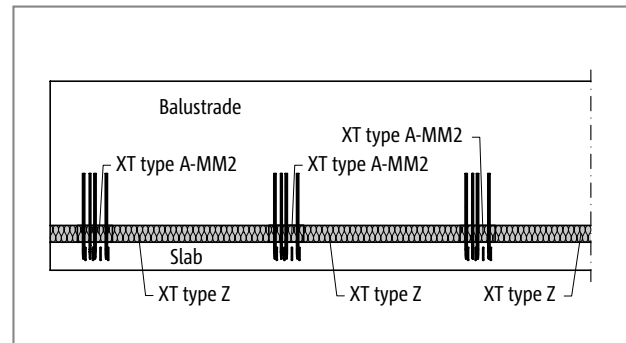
Schöck Isokorb® XT type A, Z: Parapet (XT type A-MM2)
